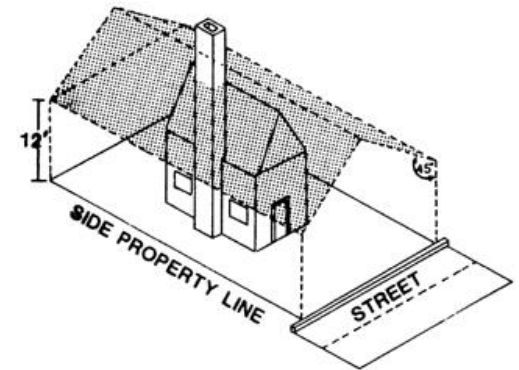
PLATE LINE: The point where the top of the wall assembly meets the roof structure.
